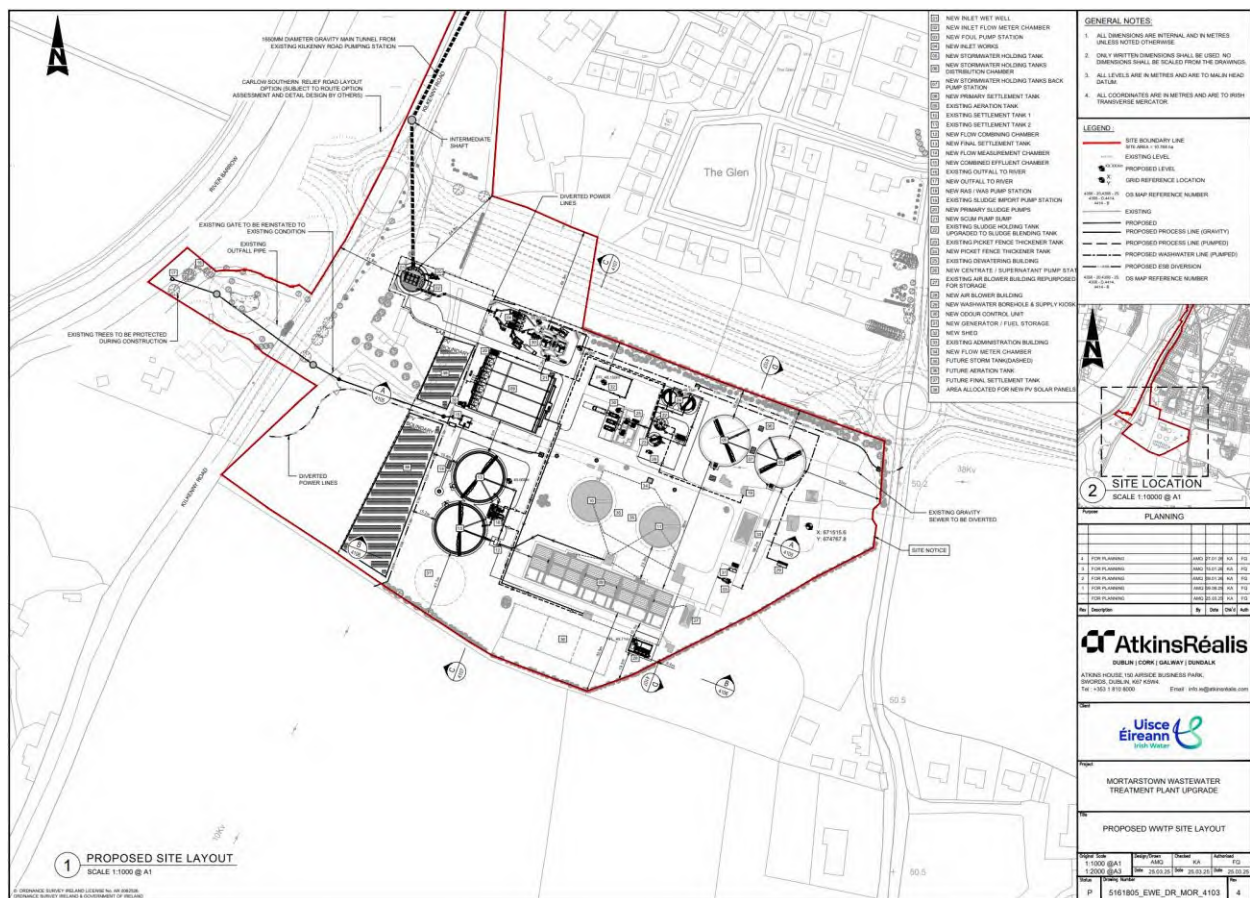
Proposed excavation area (courtesy AtkinsRéalis)
